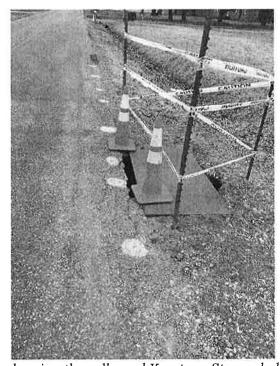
Photograph showing the collapsed Keystone St. manhole constructed in 1968.
